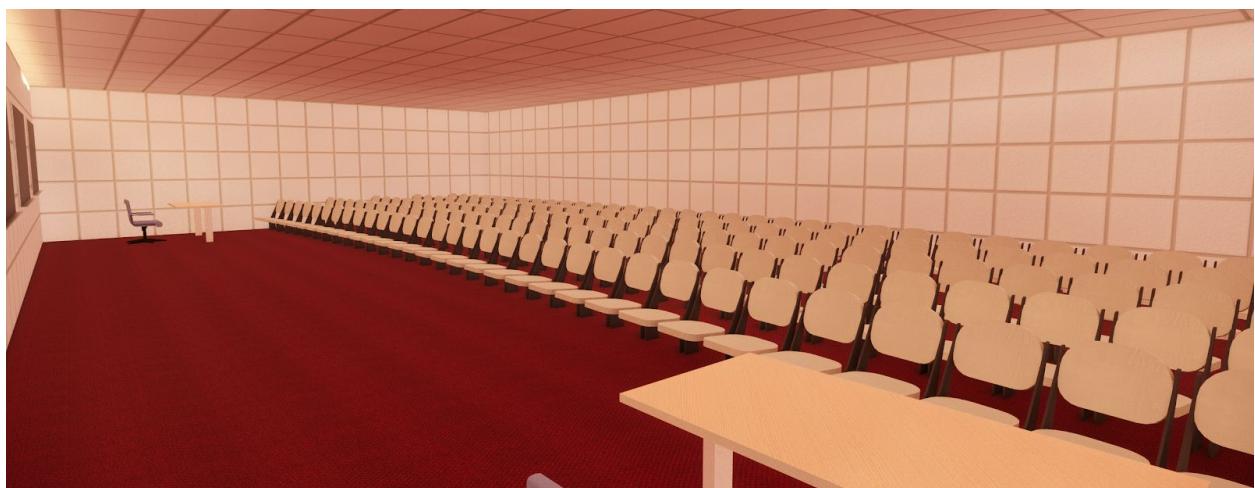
Floor 4 classrooms LEED Acoustic Walls
